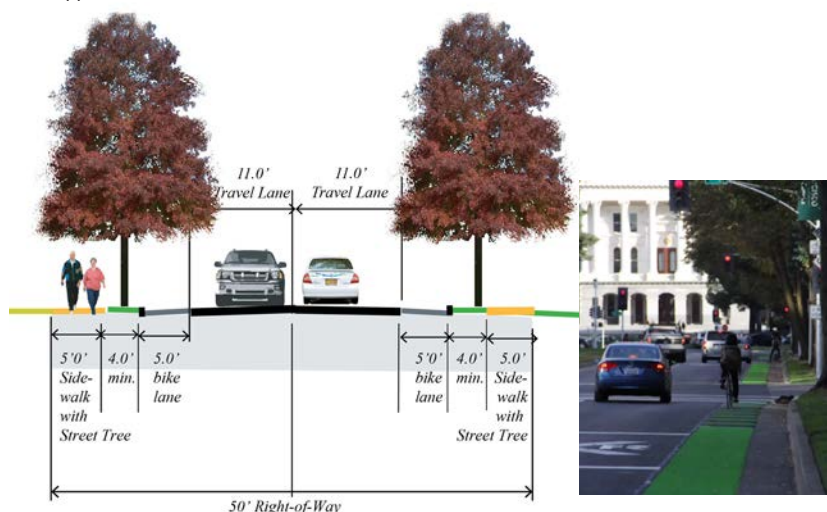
City of Lewes section applies to any newly constructed, closed drainage section (curb and gutter) only; section does not apply to existing open drainage. The recommended section reflects the availability of a 50' right-of-way. Where that R/W narrows to 40' east of 4th Street, and utilities or stormwater compete for available space, pedestrian facilities and street trees will need to be removed from one side of the street and/or bike lanes replaced with shared roadway.
